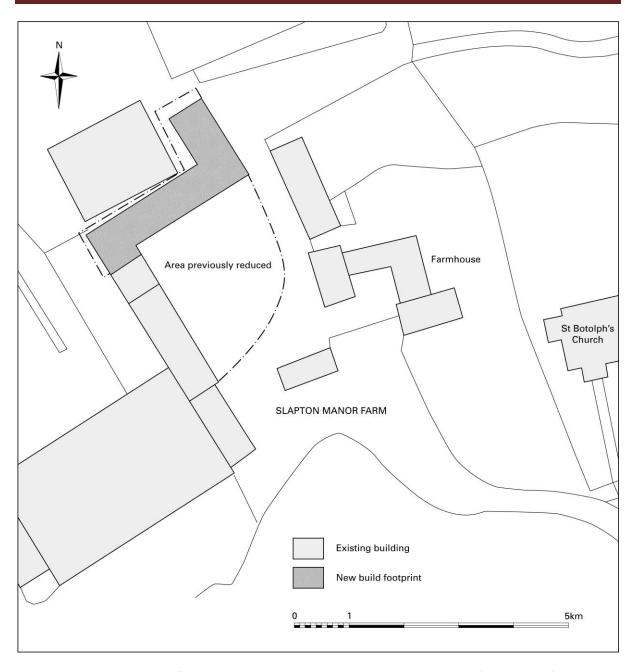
Location of the new building and ground previously reduced (Andy Isham)
